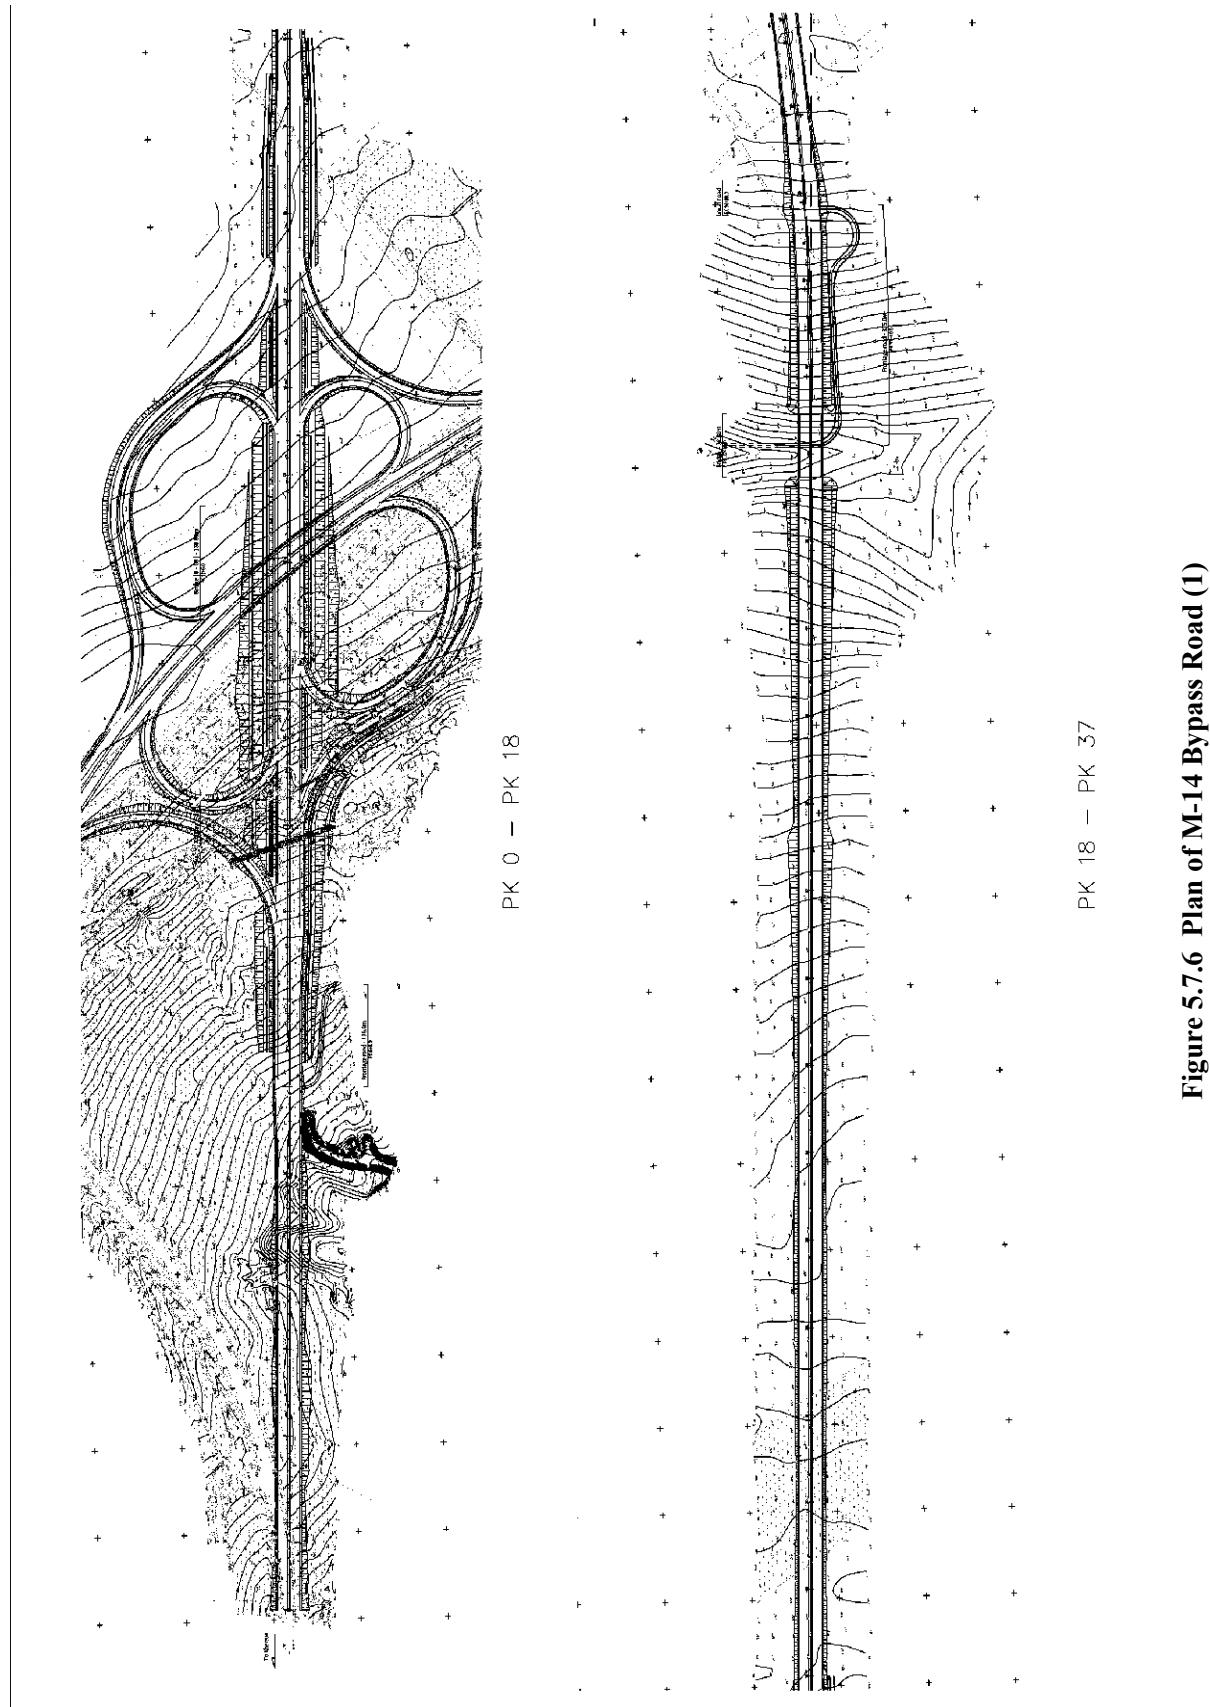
Plan of M-14 Bypass Road (1)
